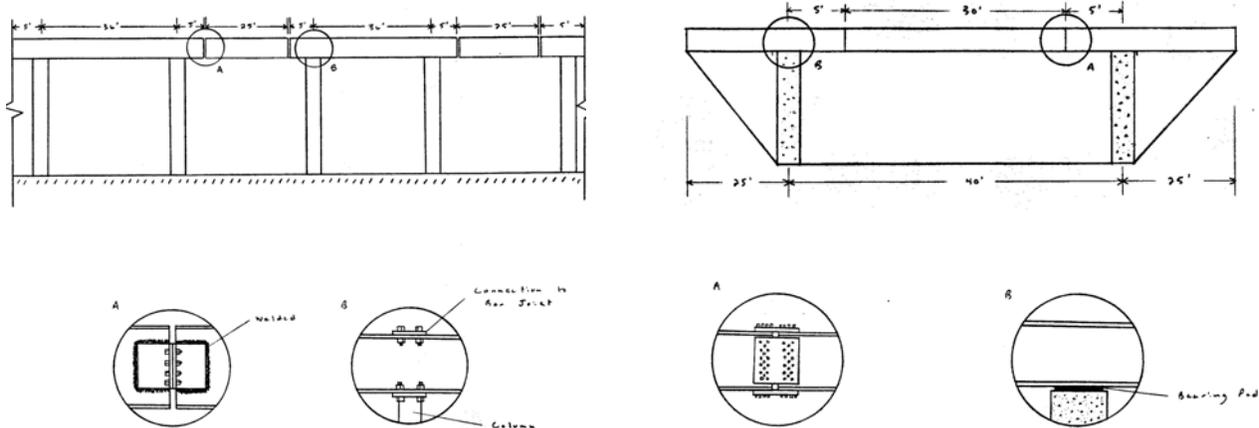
Student sketches of cantilever girder and continuous girder with connection details<sup>7</sup> (With permission from ASCE)
